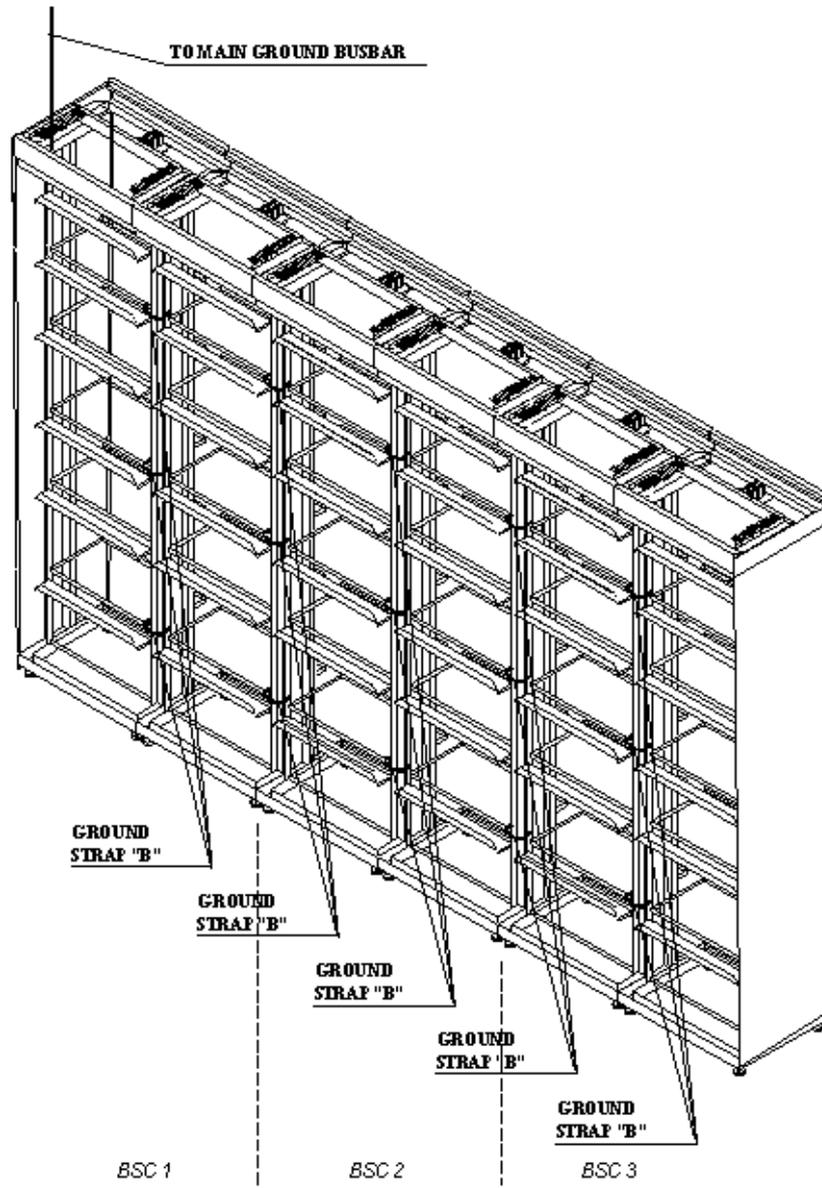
Alternative 2: Grounding the racks when BSCs (1-3) are mounted in the same EMC space; the side panels installed only at the end of rows. Note that the cartridges and doors are not shown in figure.
